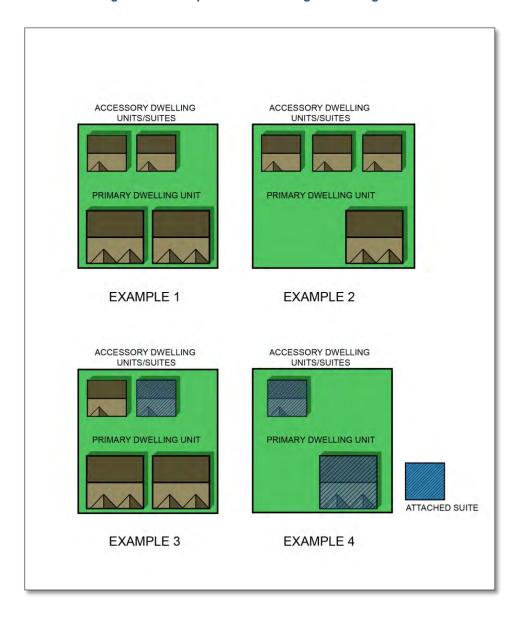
Examples of A-1 Dwelling Unit Configurations
